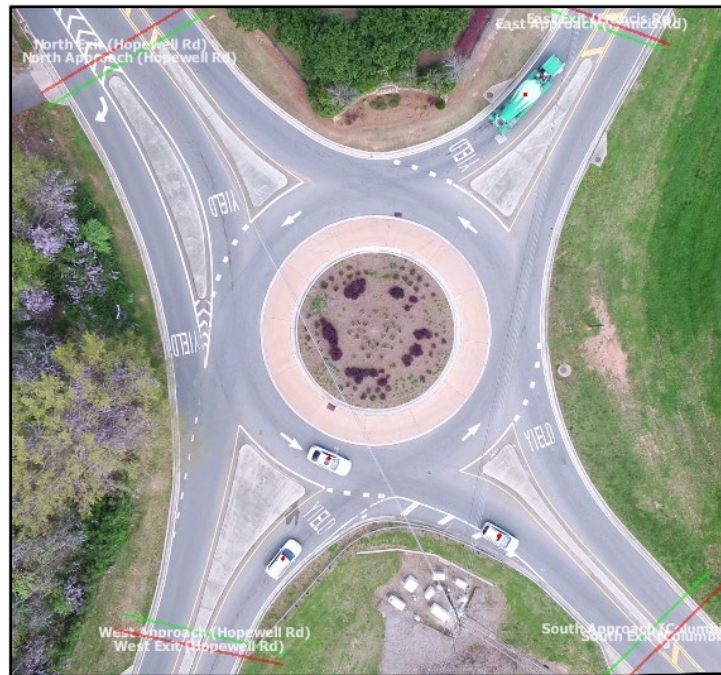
Photo. Typical setup of entry and exit gates at a roundabout.
